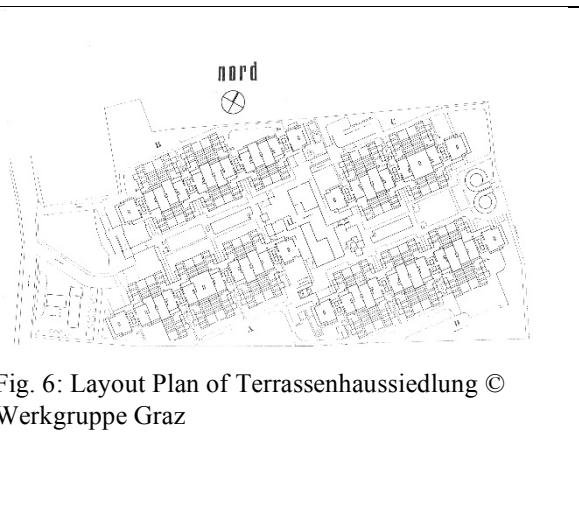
Layout Plan of Terrassenhaussiedlung © Werkgruppe Graz
